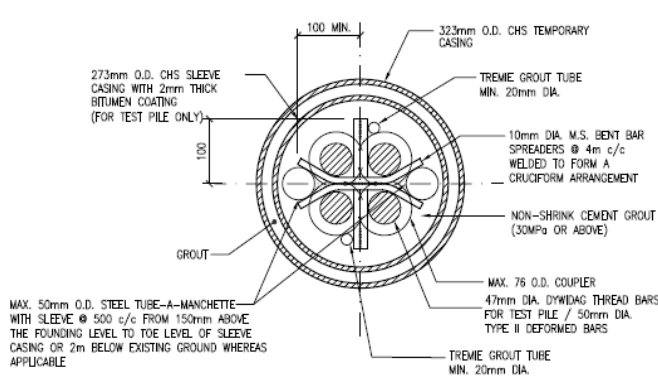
Typical grout pipe arrangement of shaft-grouted mini-pile
